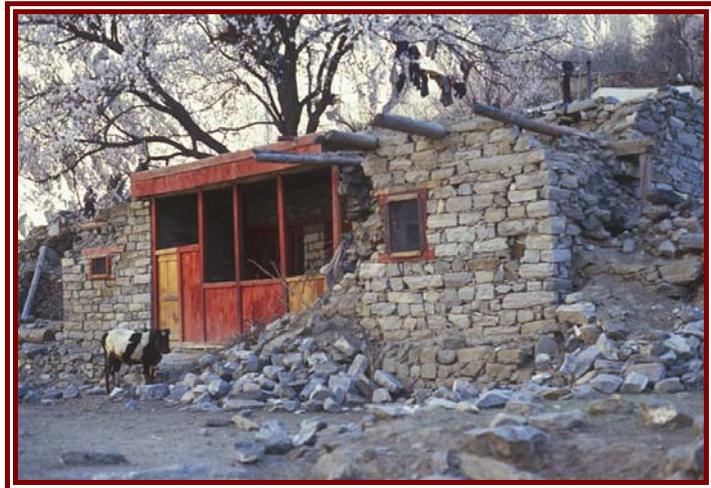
Internal damage to non-load bearing cross walls built in rubble masonry
